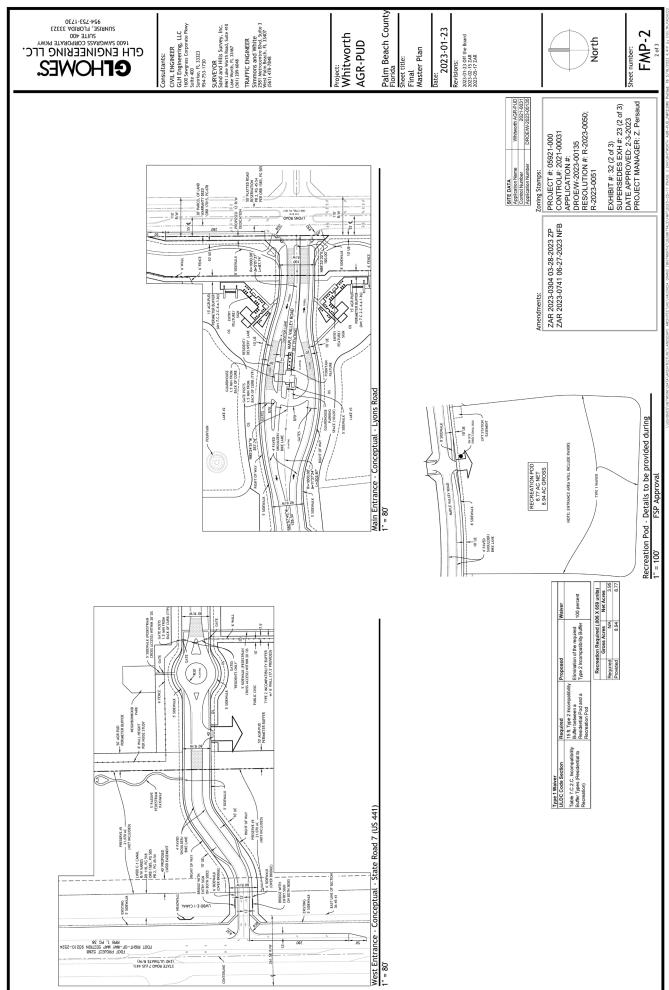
Approved Final Master Plan dated June 27, 2023 (Page 2 of 3)
